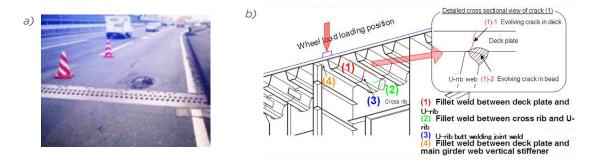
Fatigue of orthotropic steel deck a) Example of damage to pavement caused by fatigue of orthotropic steel deck; b) Types of orthotropic steel deck fatigue crack (Public Works Research Institute, s.d.)
